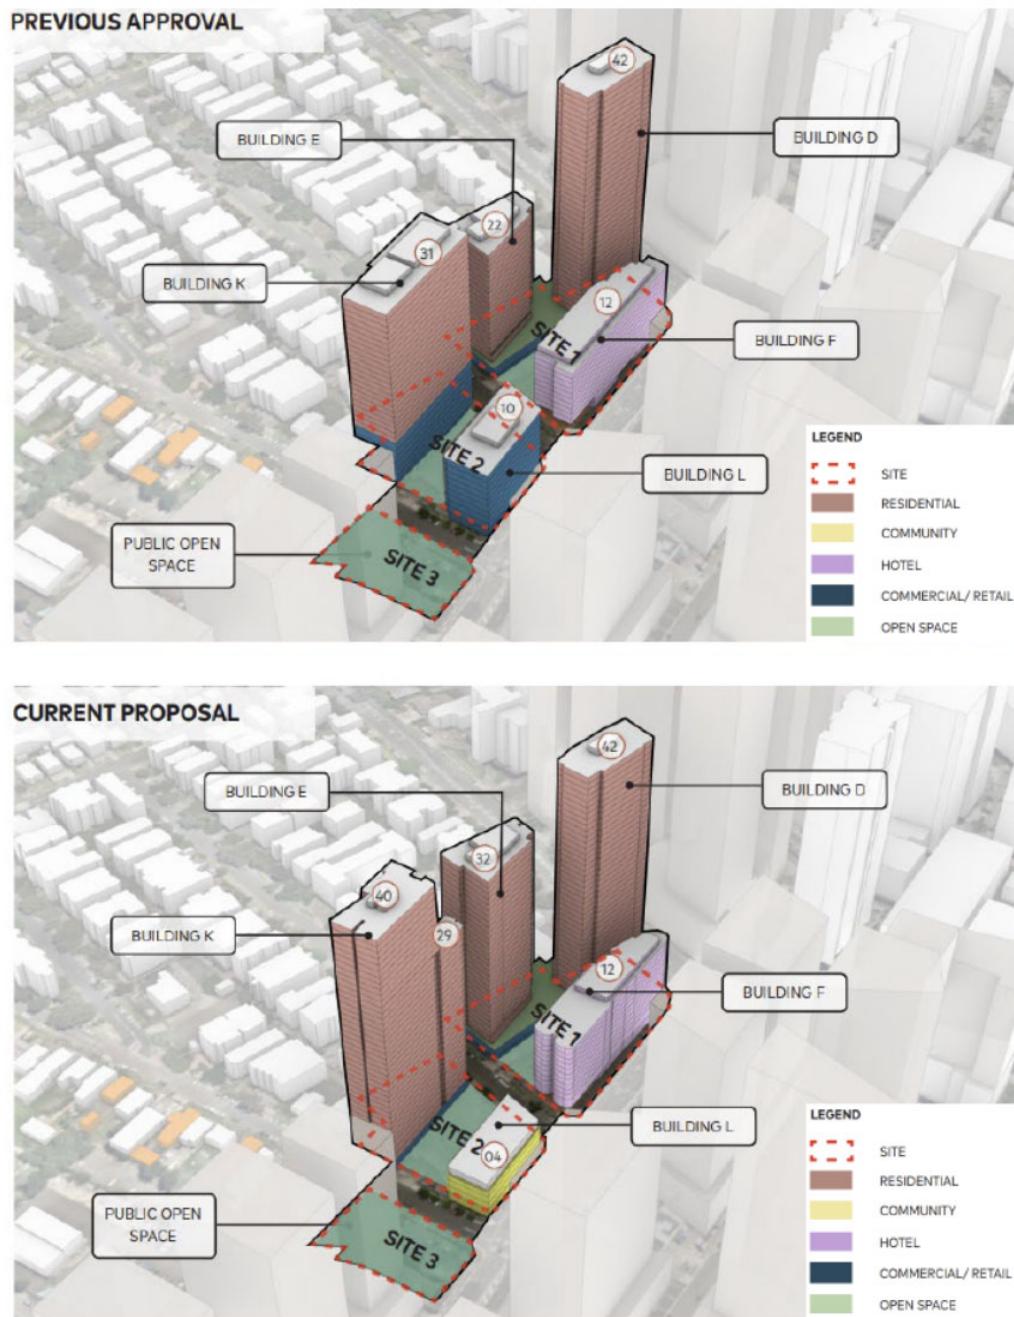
Comparison of site layout and built form permissible under the current and proposed planning controls.
